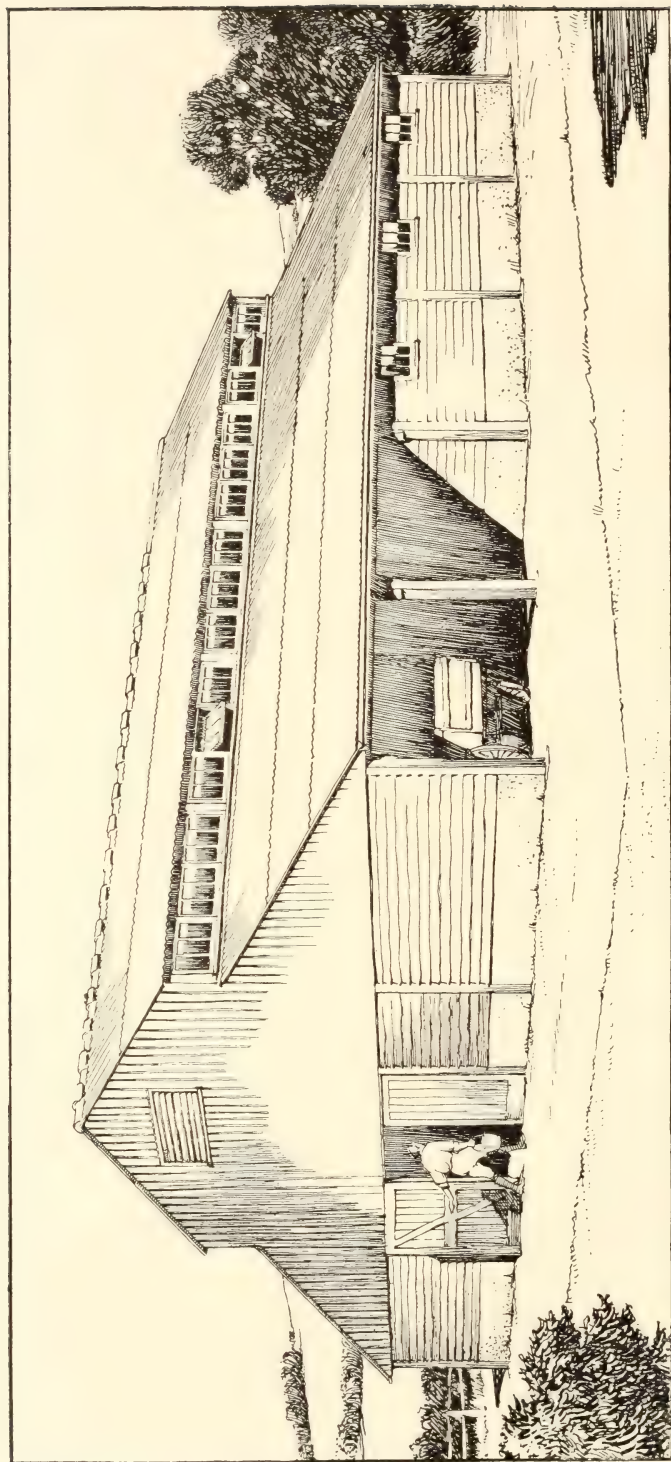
General View of the Building adapted from the West Riding Standard Type.
